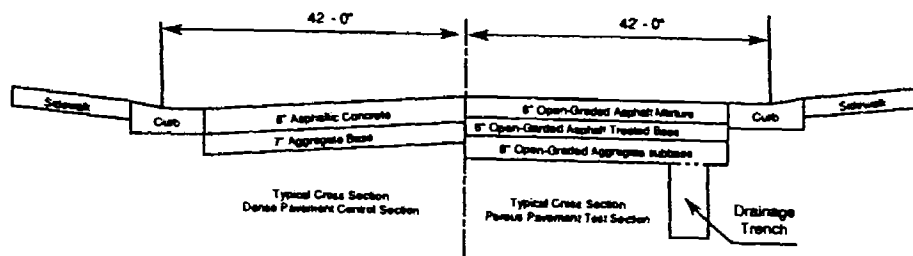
TYPICAL CROSS SECTIONS OF POROUS AND CONVENTIONAL PAVEMENT
